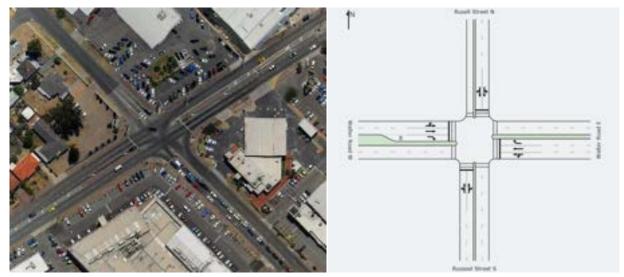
Walter Road/Russell Street Intersection – Existing Geometry
